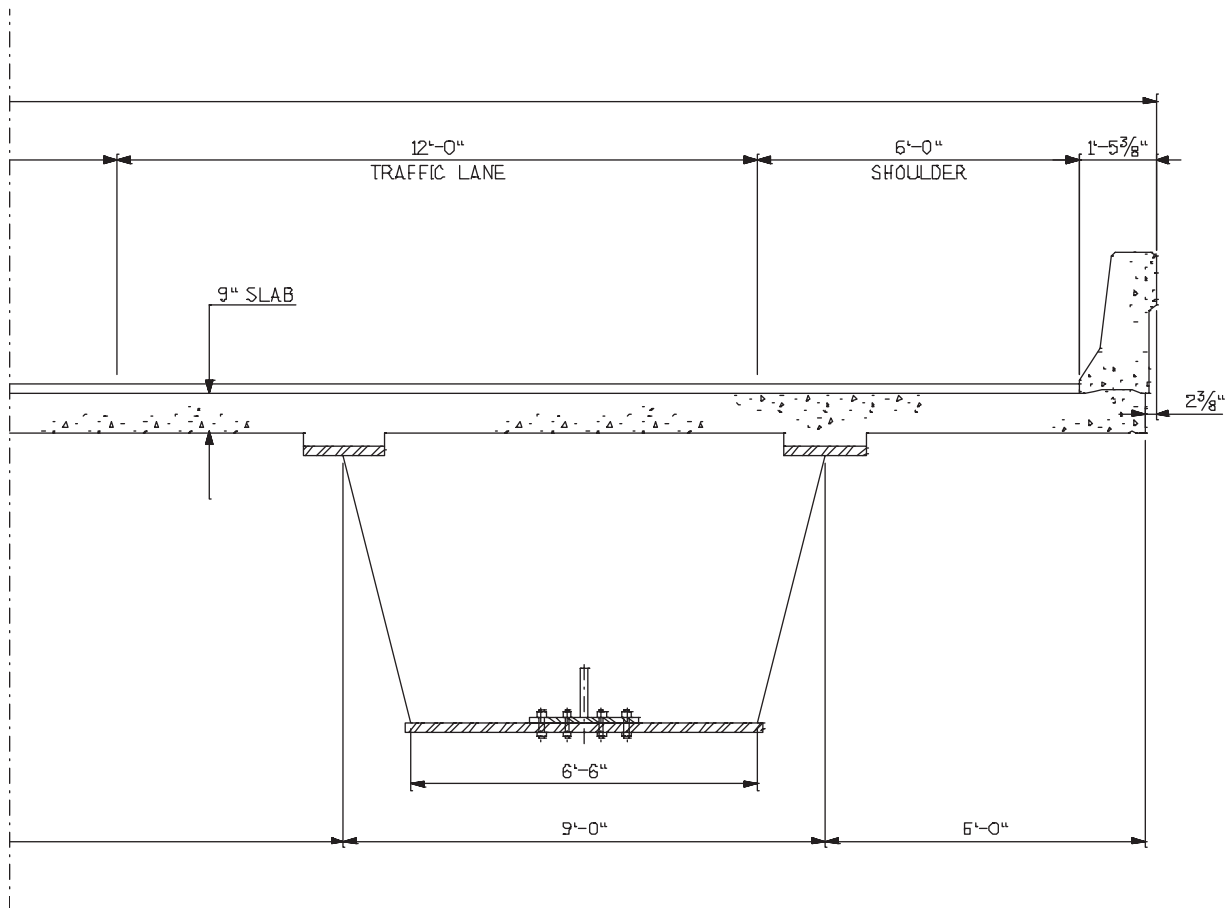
Tee section bolted to continuous lower flange of box section to provide redundancy. (Courtesy: HNTB.)
